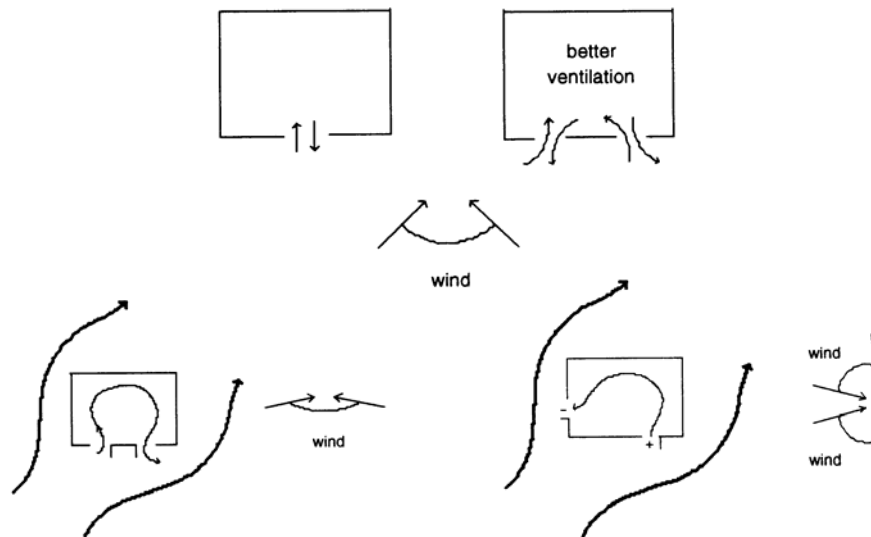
The impact of wing walls on single sided and cross ventilation. /Santamouris/.
